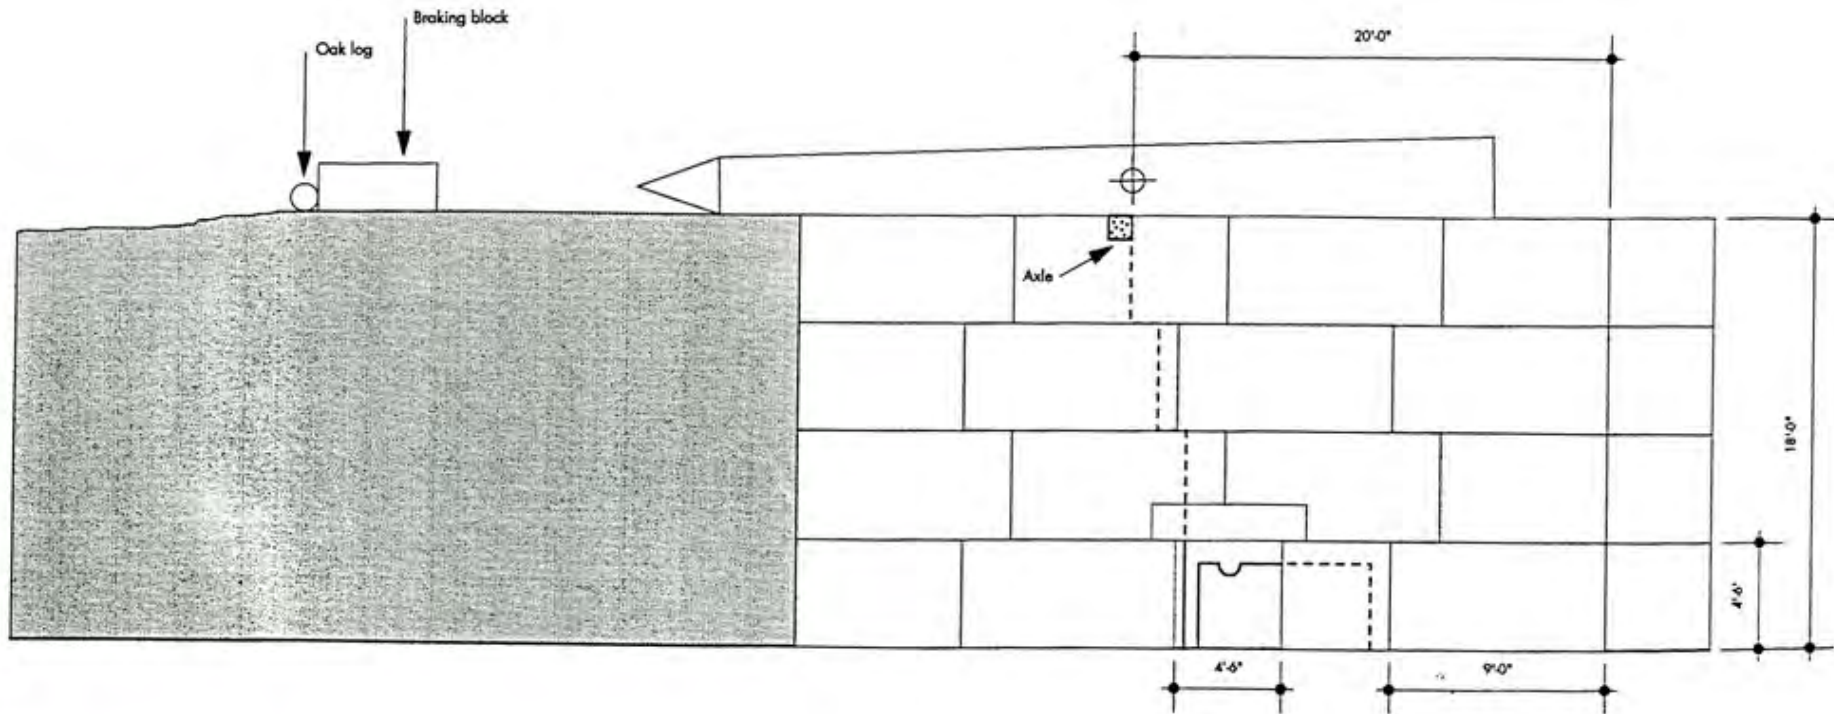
Lowering heavy blocks of stone into sand-filled shafts by removing the sand from below the blocks.
